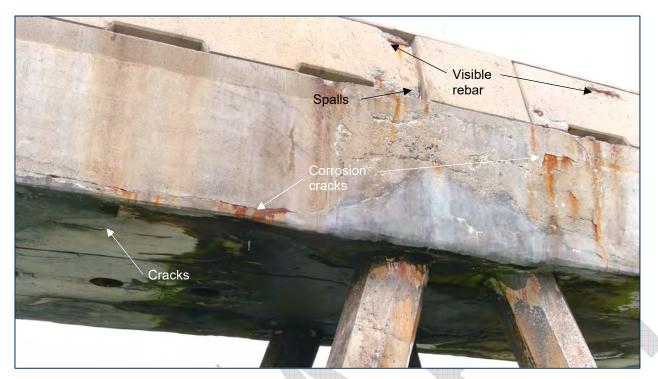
Deck Exterior at Bent 1K – South Face
